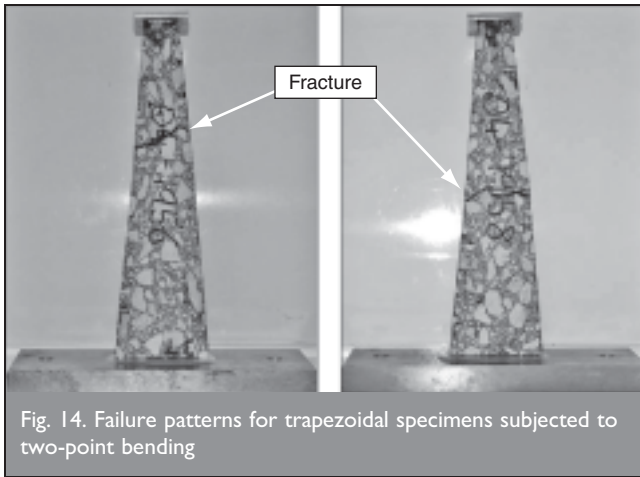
Failure patterns for trapezoidal specimens subjected to two-point bending
